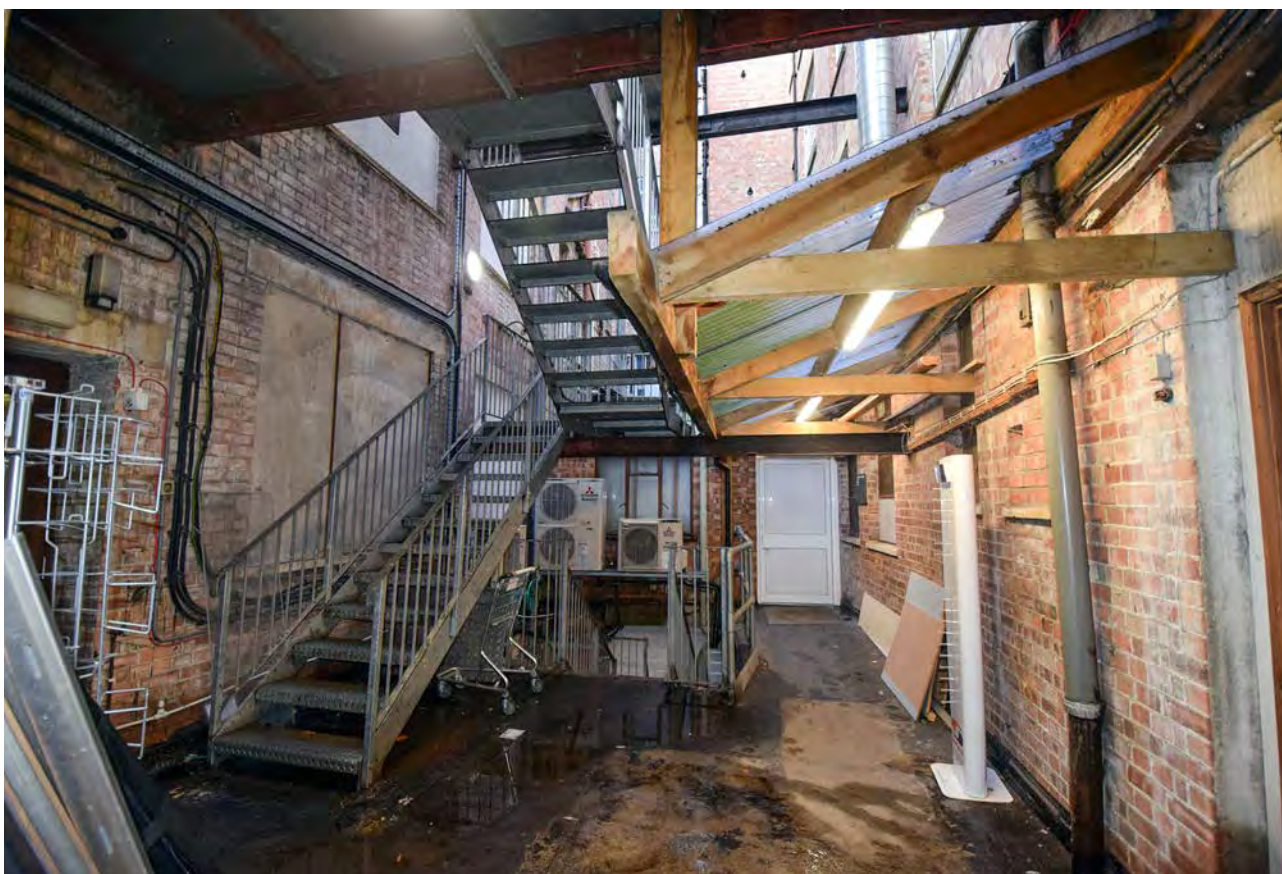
The basement of the central lightwell of 1 to 5 Broad Street, looking west
